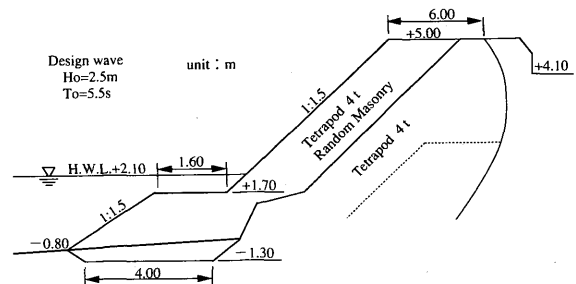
Cross section of wave absorbing sea wall of Beppu Port
